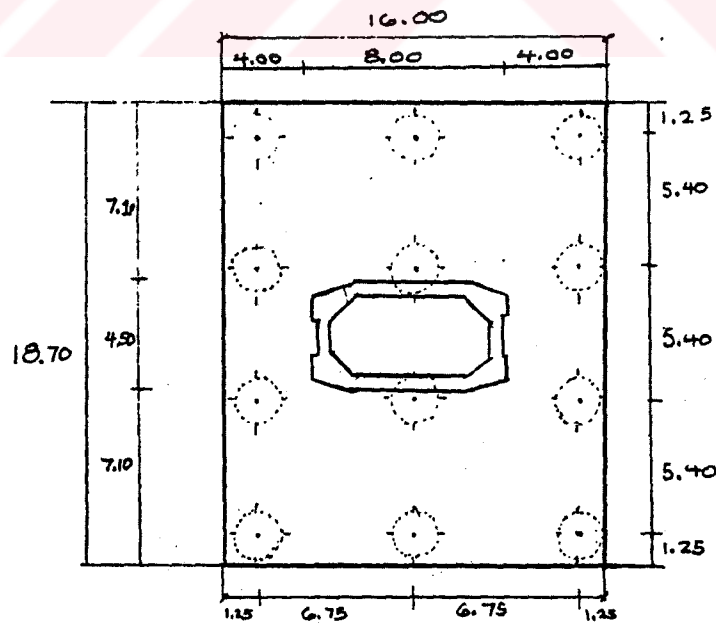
Top View of Typical Pier Section (dimensions in meter)
